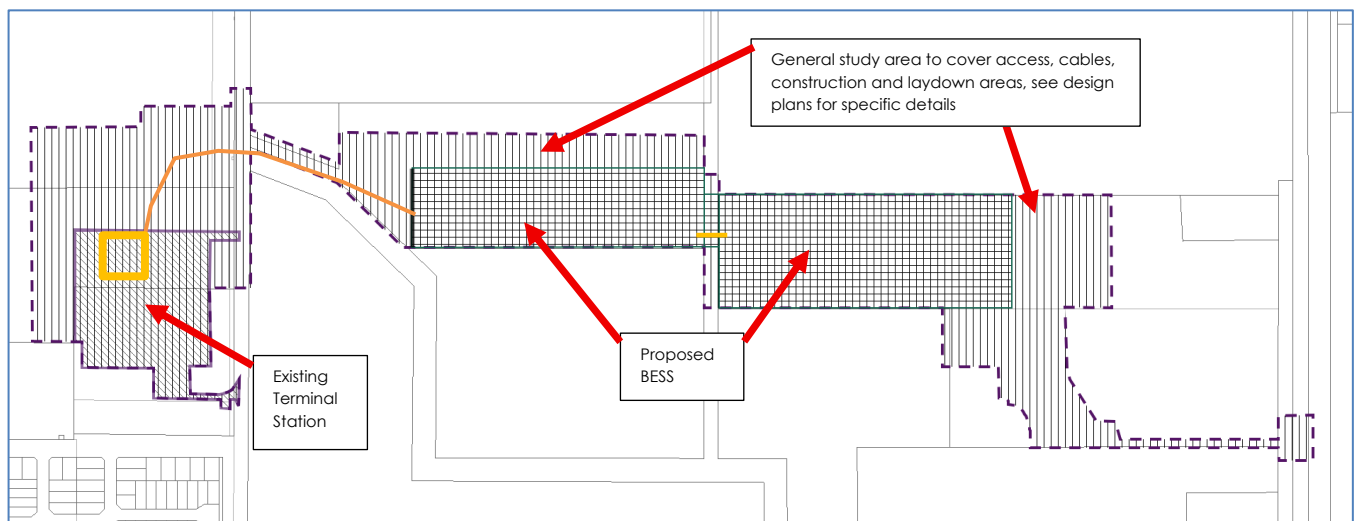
Proposed BESS site, highlighting cable connections and Cable Connection Bay
